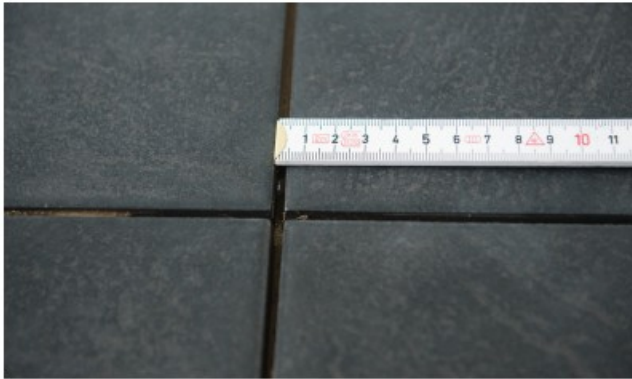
Observe the grout width: · tiles up 30 x 30 cm have 3 mm minimum grout · 40 x 60 cm tiles will have at least 5 mm grout
